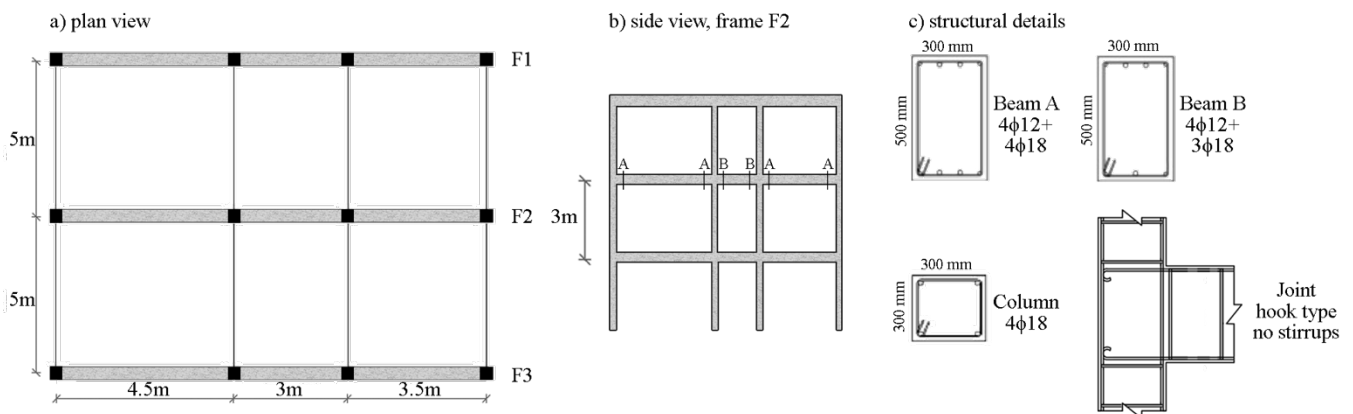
Selected case-study building: a) plan view; b) side view; c) structural details.
